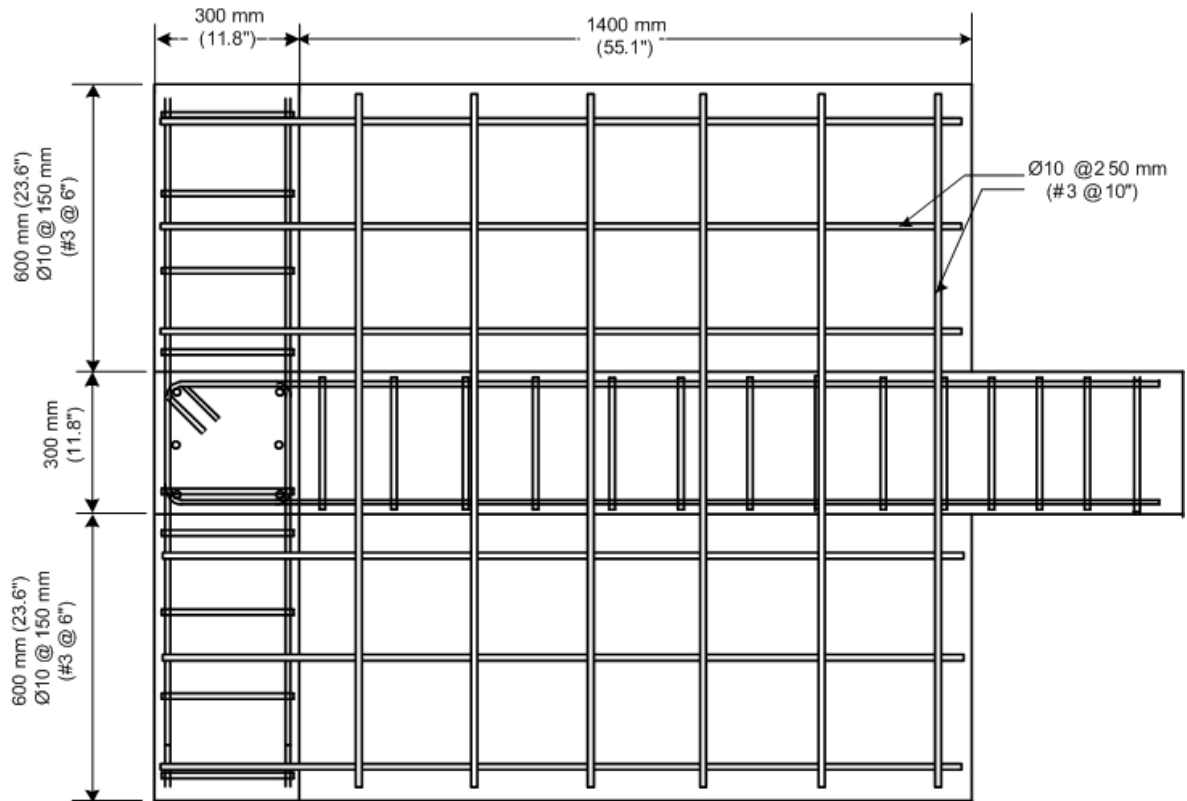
Reinforcement details of US3-ES Specimen (Plan view)
